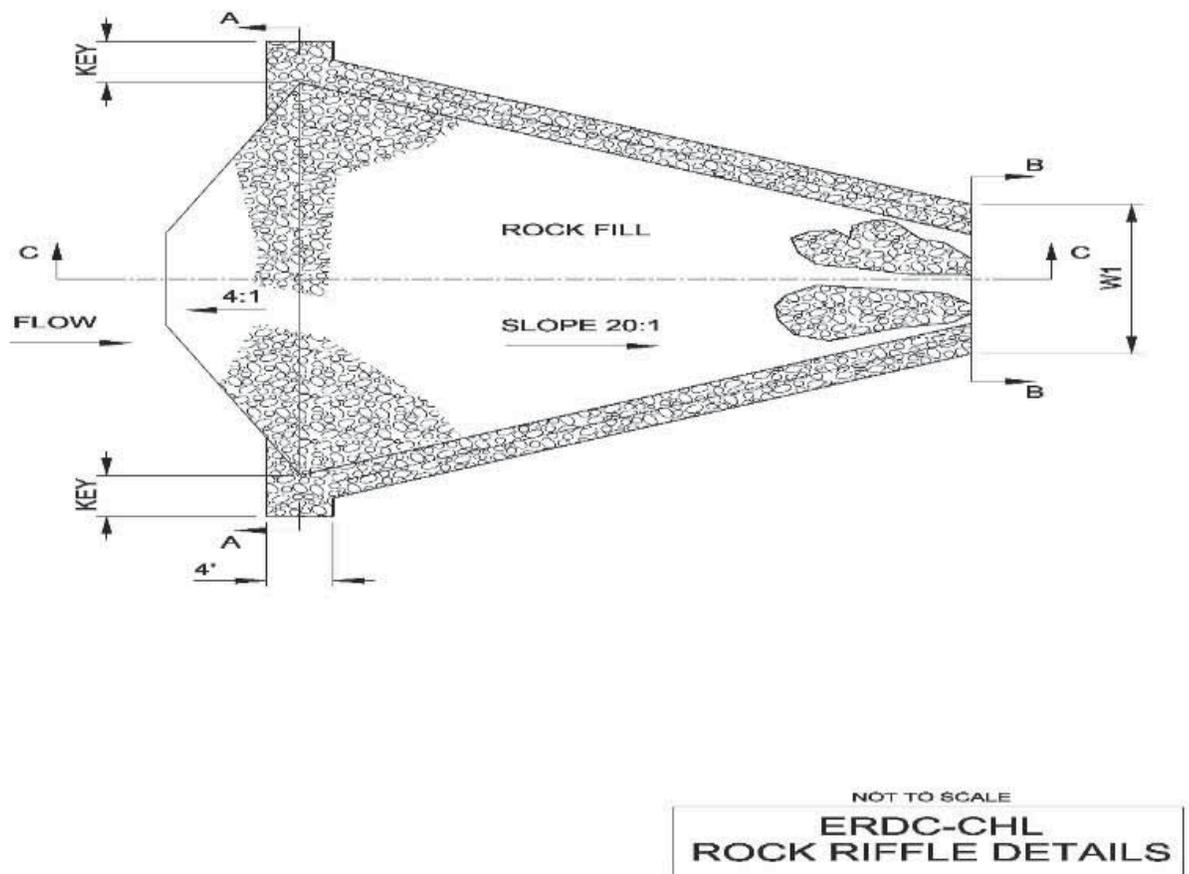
Plan View- ERDC Typical Rock Riffle Structure
